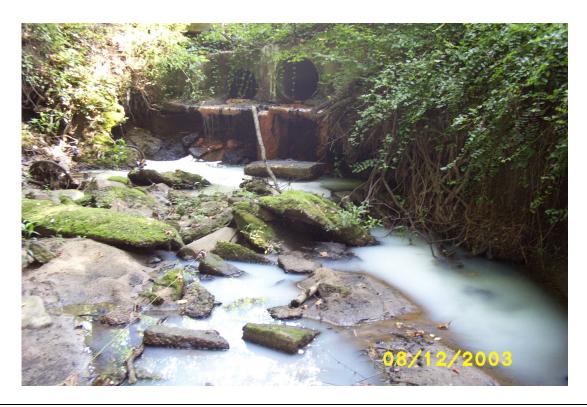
View of Drainage Pipes beneath Essex Avenue, at Delineation Points Dew-1 and B-61, looking East.
